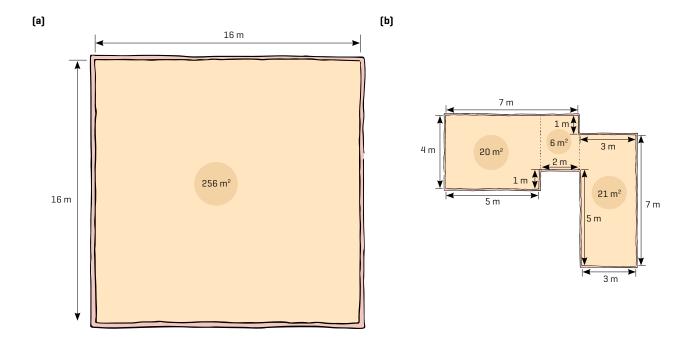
To use the tables for slab-on-ground floors in H1/AS1, you need to know the A/P ratio of the proposed building.
